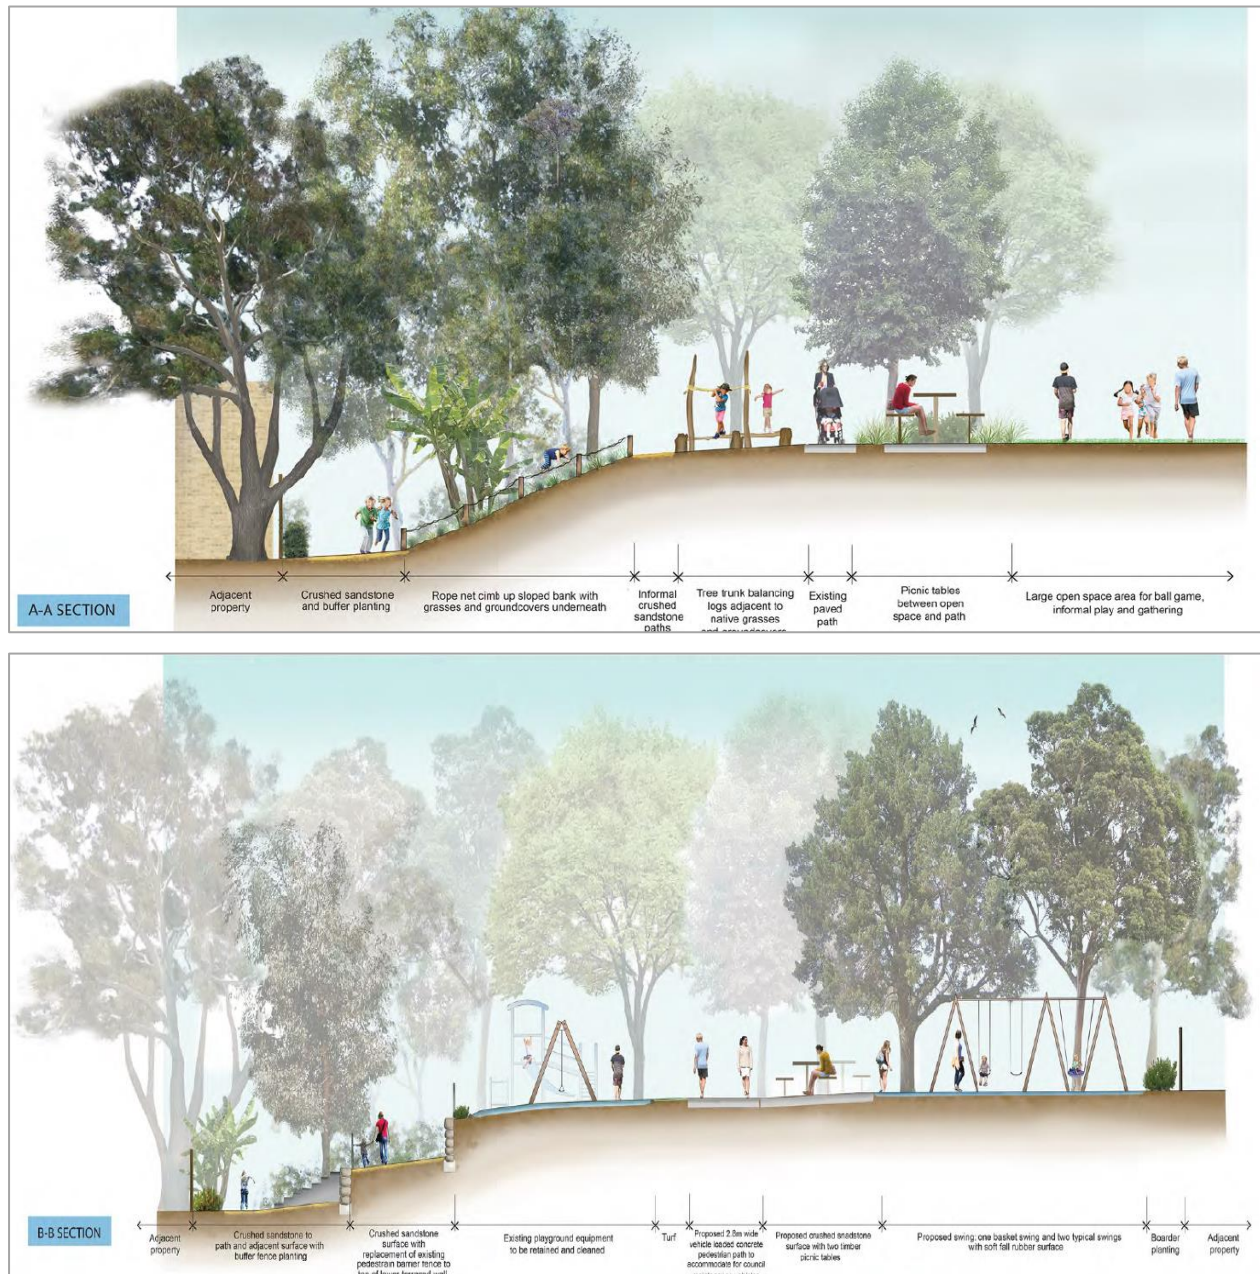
Extracts from Concept Design Sectional Elevations (Source: Woollahra Council / Thompson Berrill Landscape Architects)
